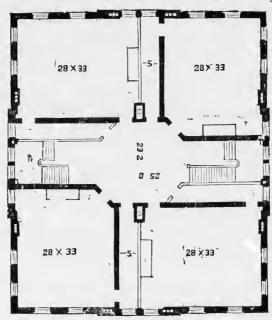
Plan of First Floor, adapted to Fig. 160,
